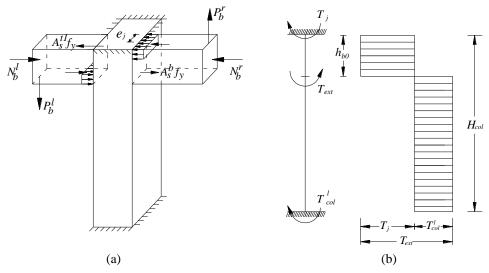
(a) forces applied by eccentric beams on column; (b) torques in joint and column
